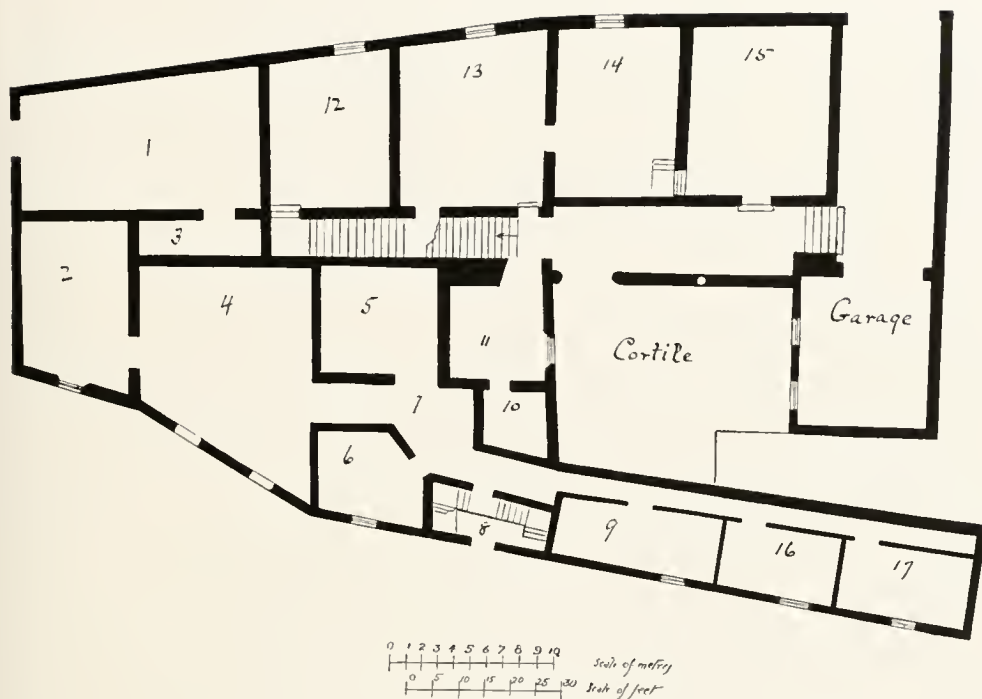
GROUND FLOOR PLAN—L'OMBRELLINO, PIAN DE'GIULLARI, NEAR FLORENCE
